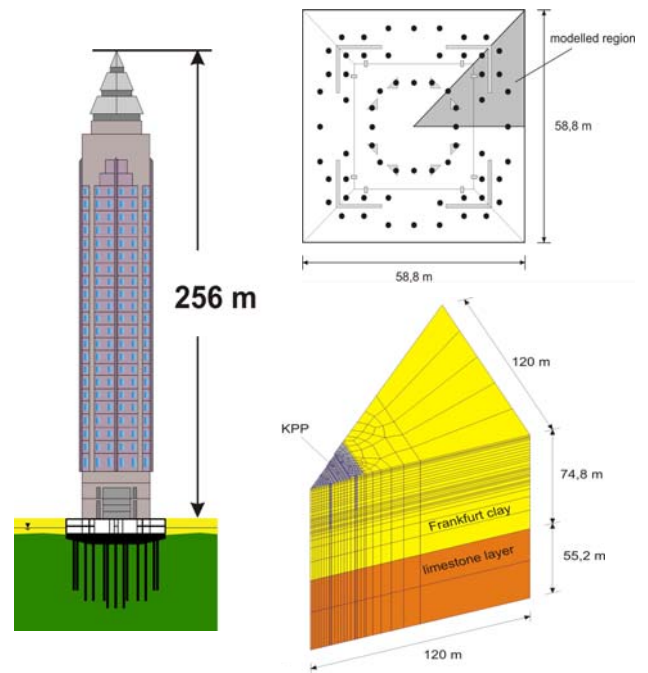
Messeturm, Frankfurt am Main: View, ground plan and FE mesh
